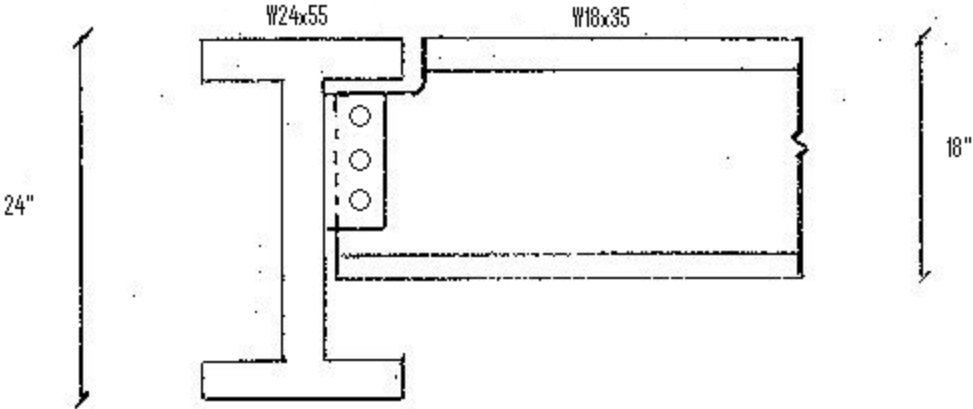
W24x55 Girder and W18x35 Beam Connection Fit Up
